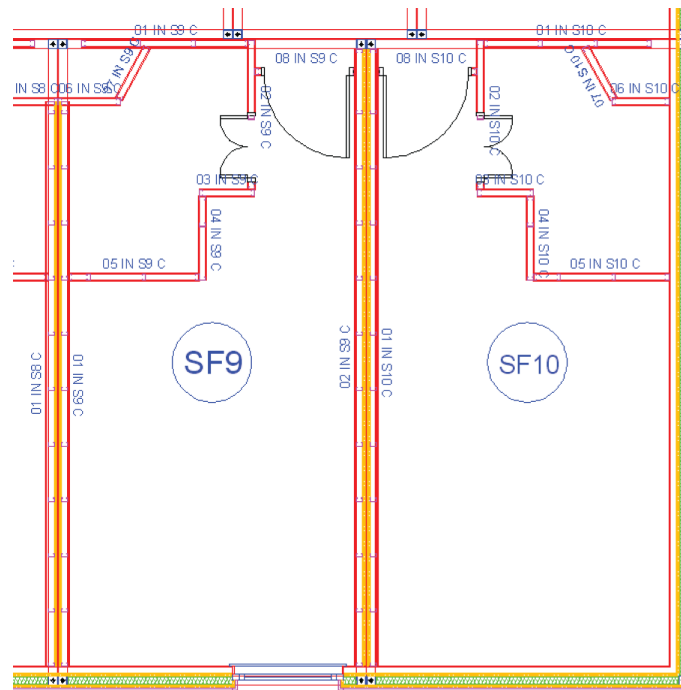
Building plan and 3D model generated by the BIM: Details in building plan
